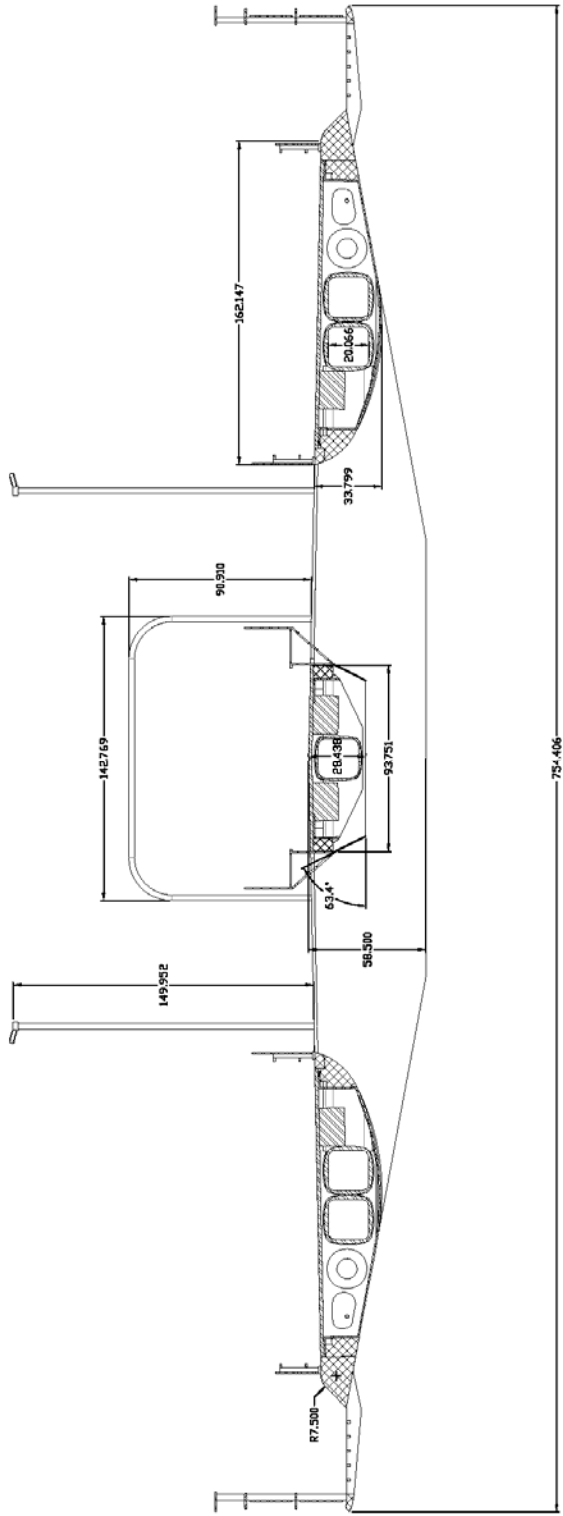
PROTOTYPE DIMENSIONS OF CRASH BARRIER
